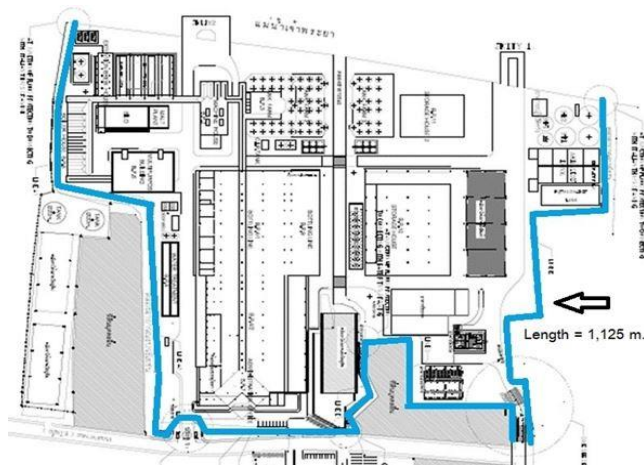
Flood wall protection plan of Pathum Thani brewery project
